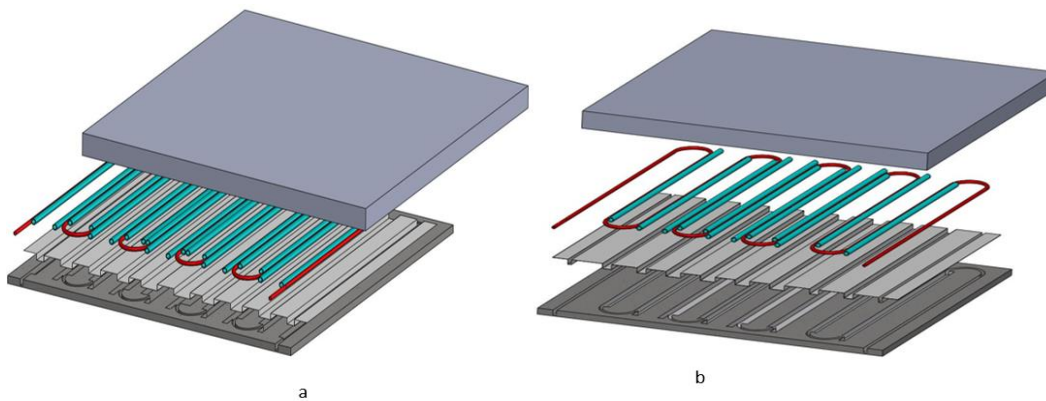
Assembly pictures a) Panel 1 b) Panel 2
